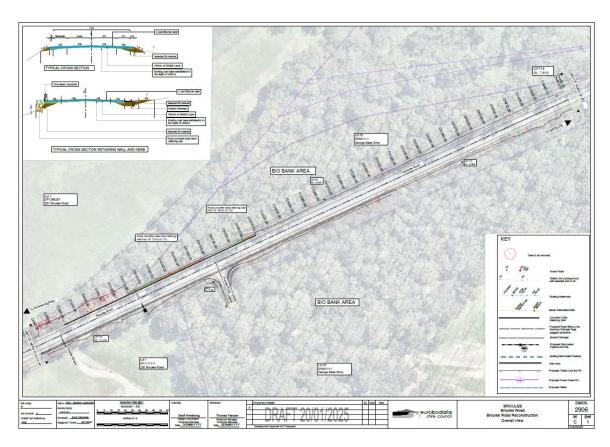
Plan of Broulee Road reconstruction showing full scope of works.
